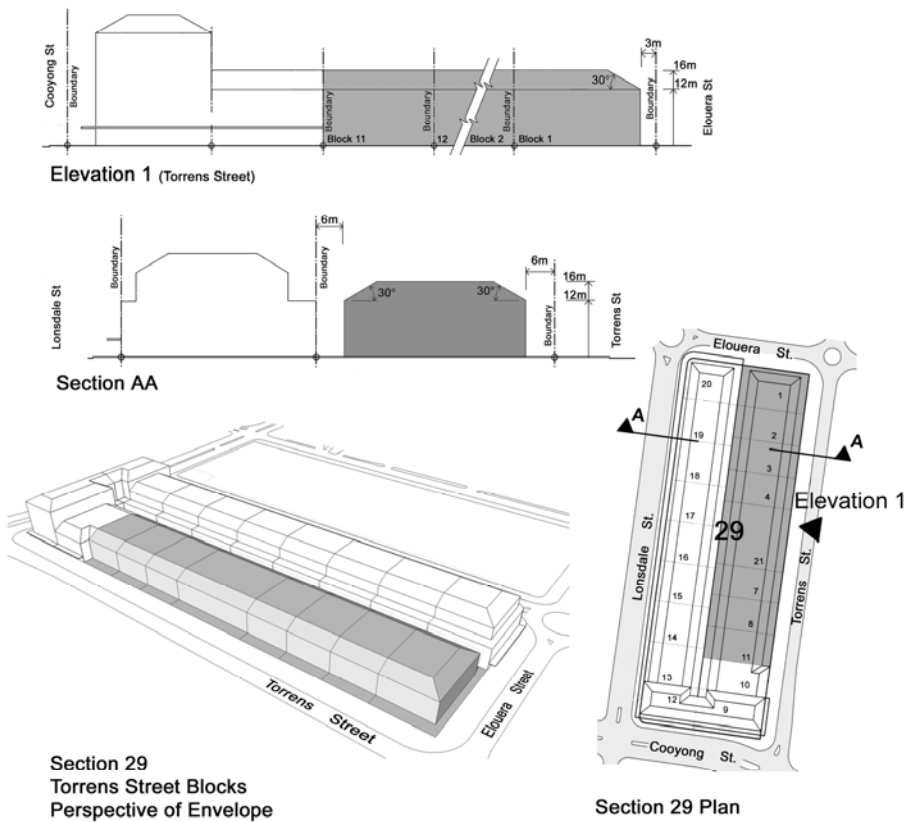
Building Envelope Diagram - Braddon section 29 blocks 1– 4, 7,8, 10, 11and 21
